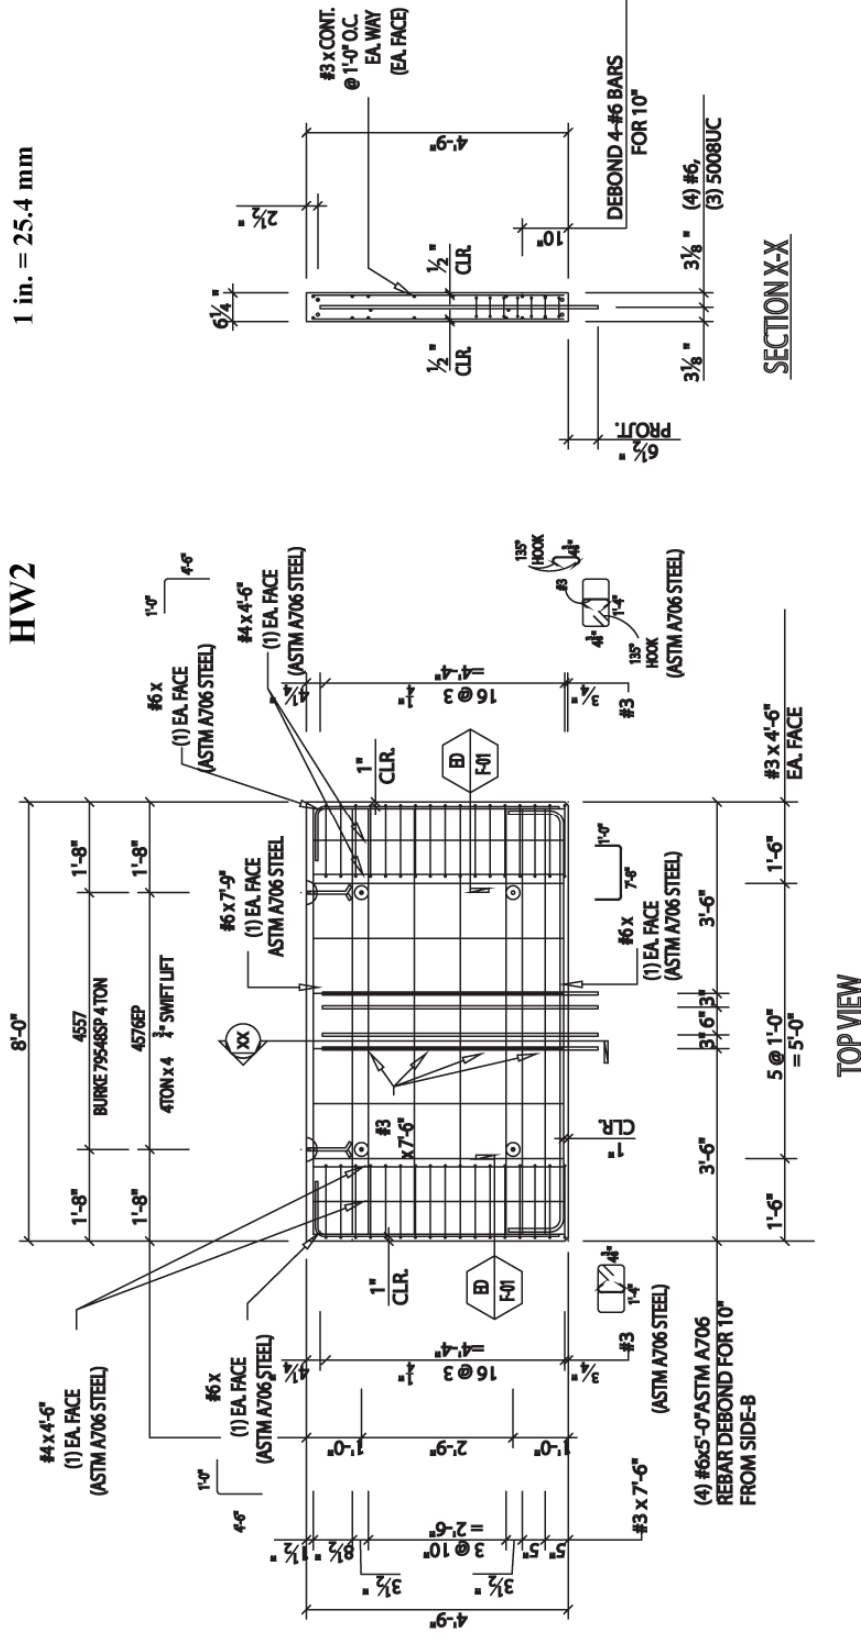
Base Panel Details for Specimen HW2 (Elevation View, Courtesy of the Consulting Engineers Group, Inc., Texas, USA)
